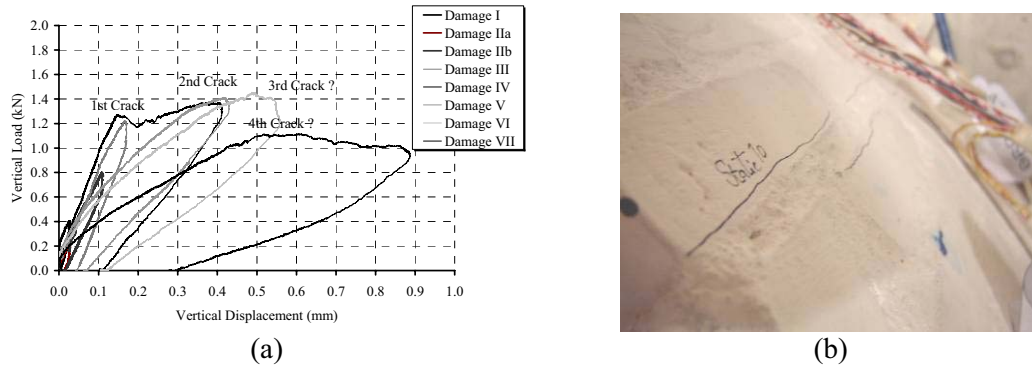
Arch model damage scenarios: (a) static test; and (b) one crack with 0.05 mm width
